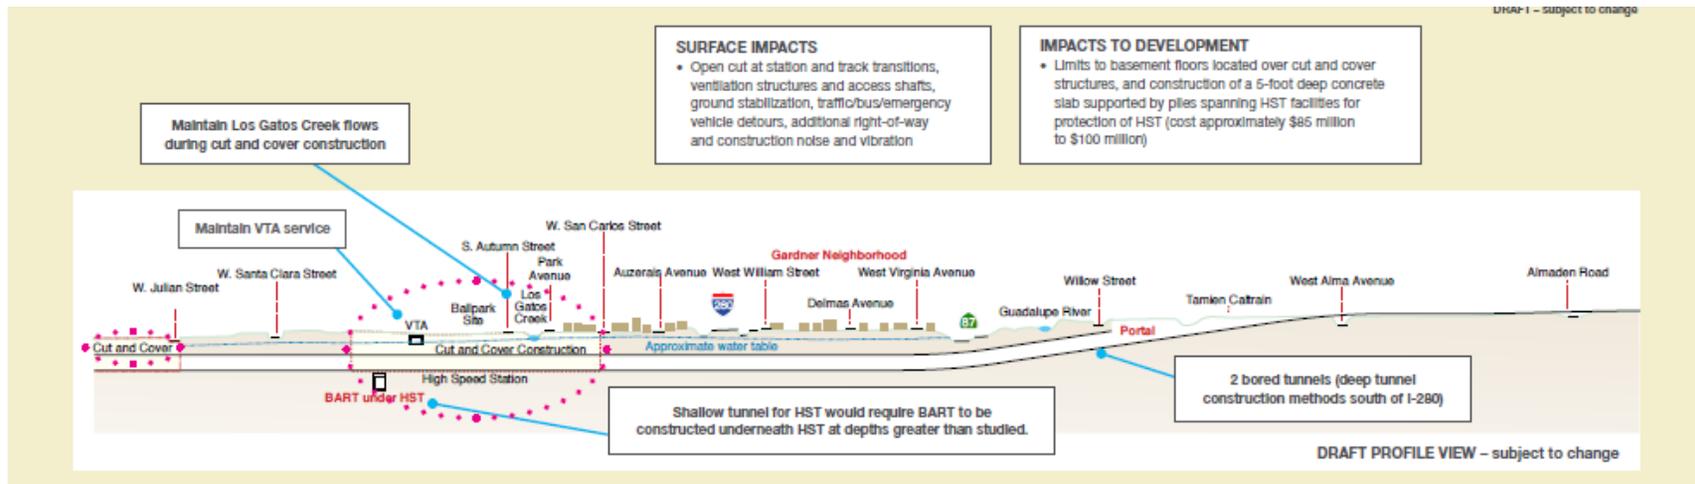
PROFILE OF SHALLOW TUNNEL/STATION ALTERNATIVE
